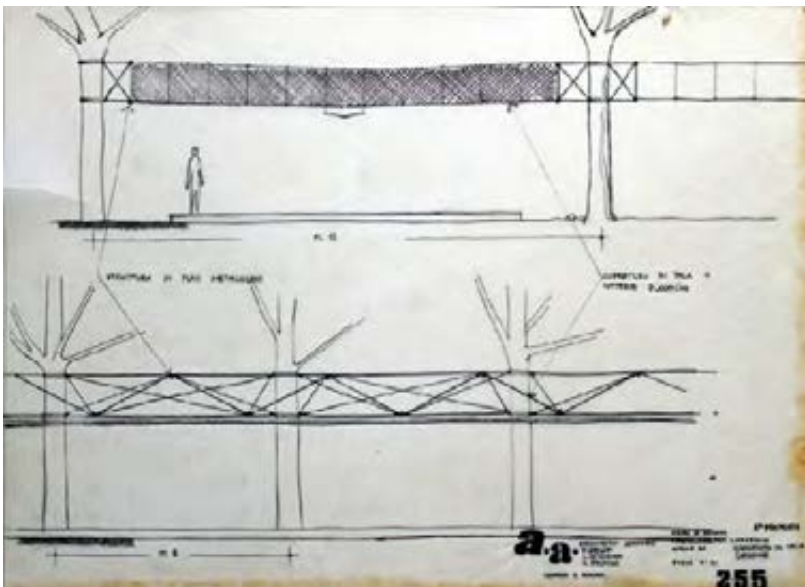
Trade Pavilion roof structure's section, first solution_CASVA concession
